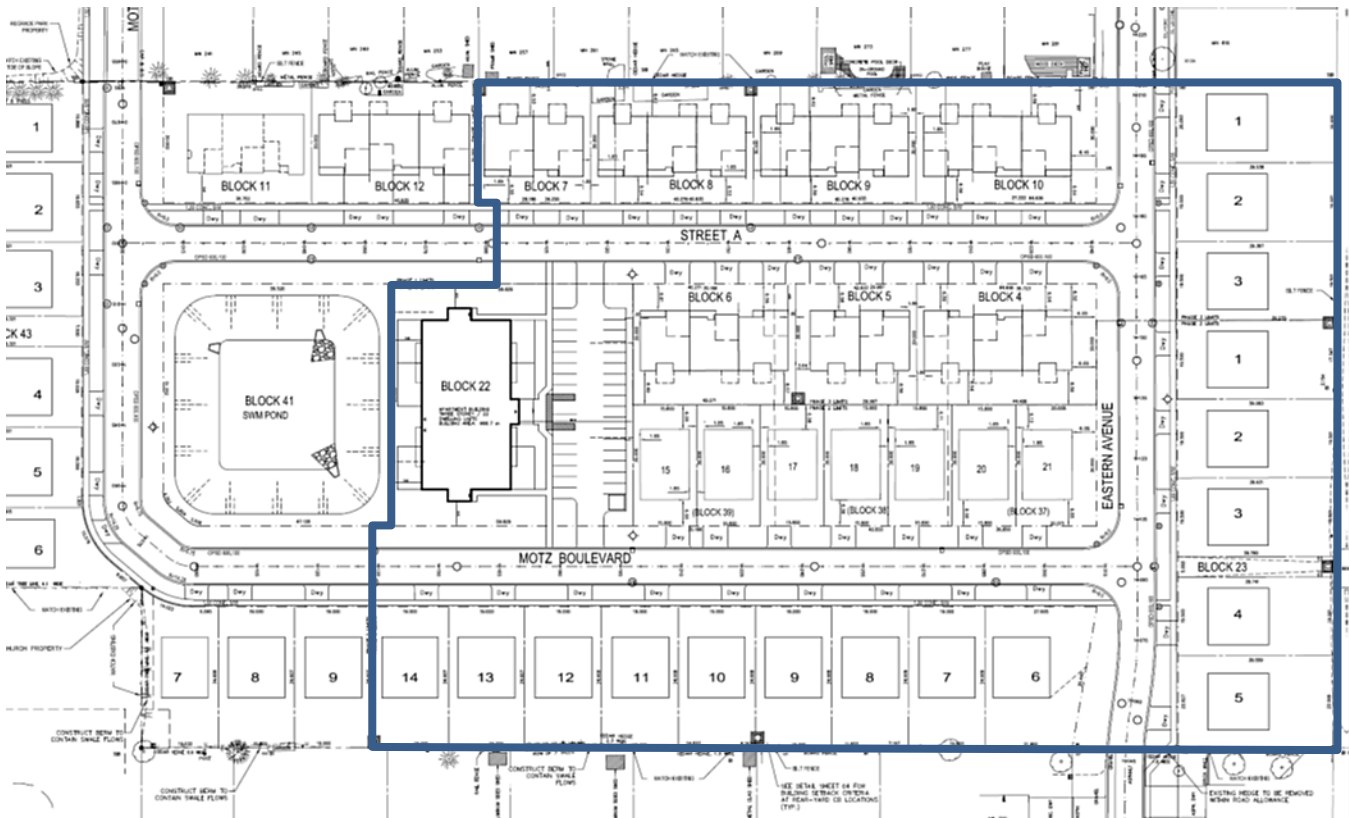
Proposed Revised Subdivision Layout with Building Footprints (blue outline)
